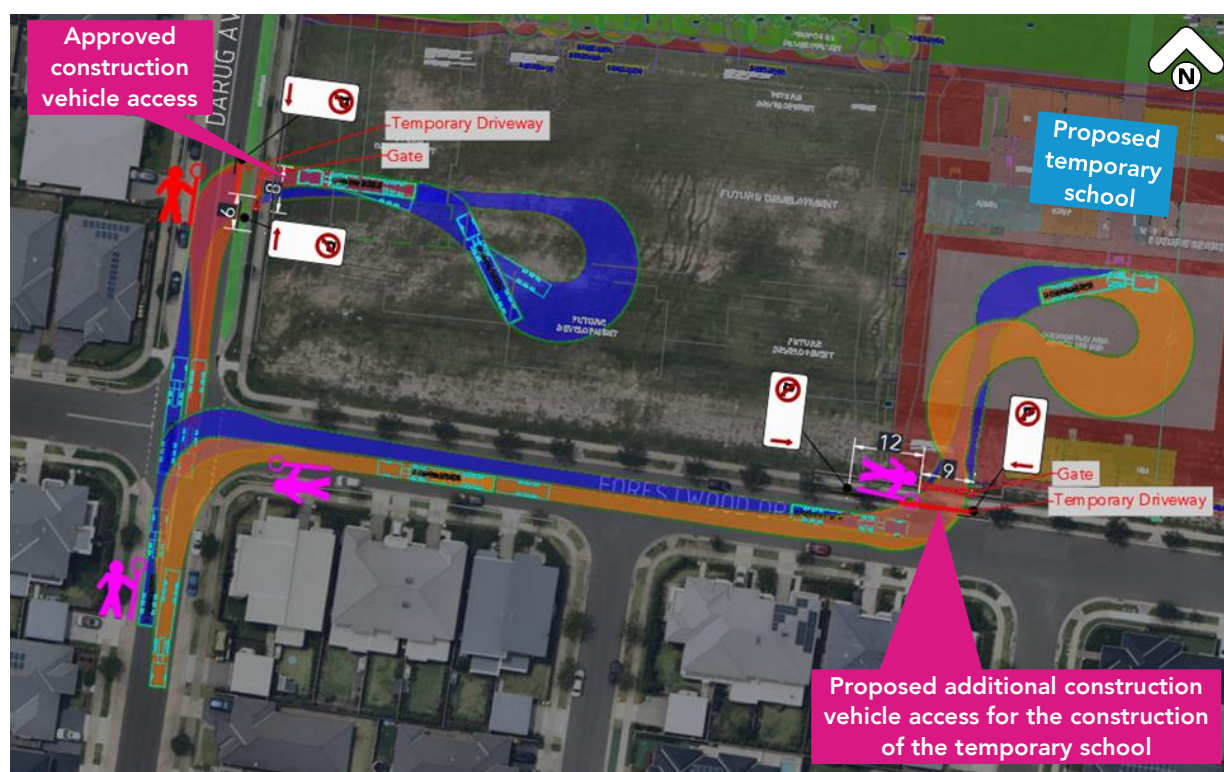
Proposed construction vehicle access for the construction of the temporary school
